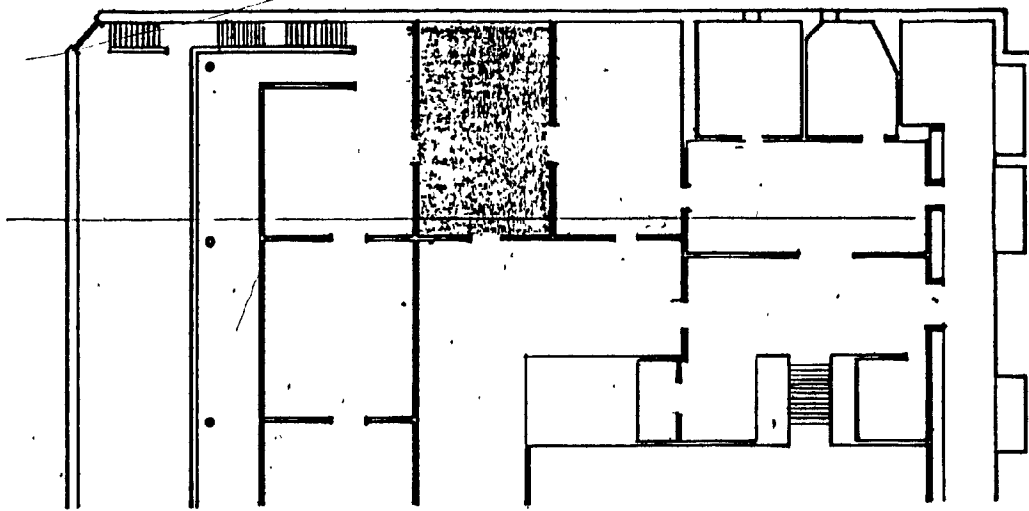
Partial floor plan of the American wing. Gallery 218 is shaded
